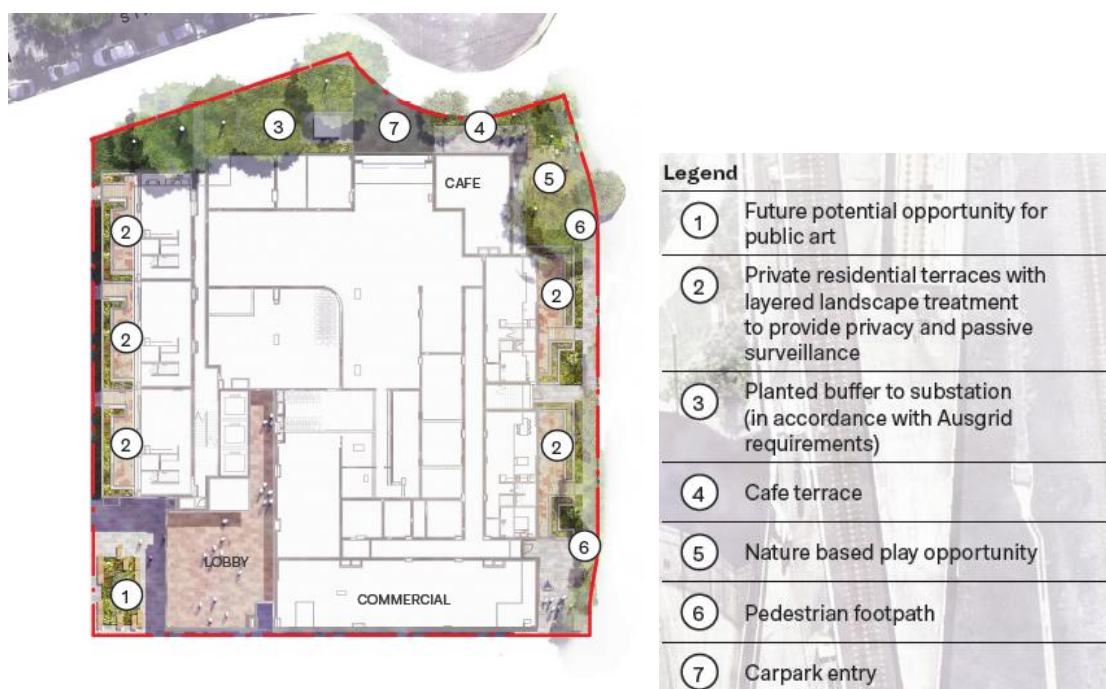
Landscape Plans – Ground Floor (Source: Oculus)
